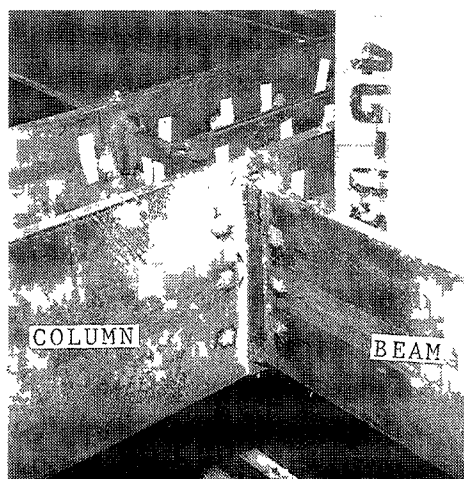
Panel zone deformation after test (SPEC. XKN C)
